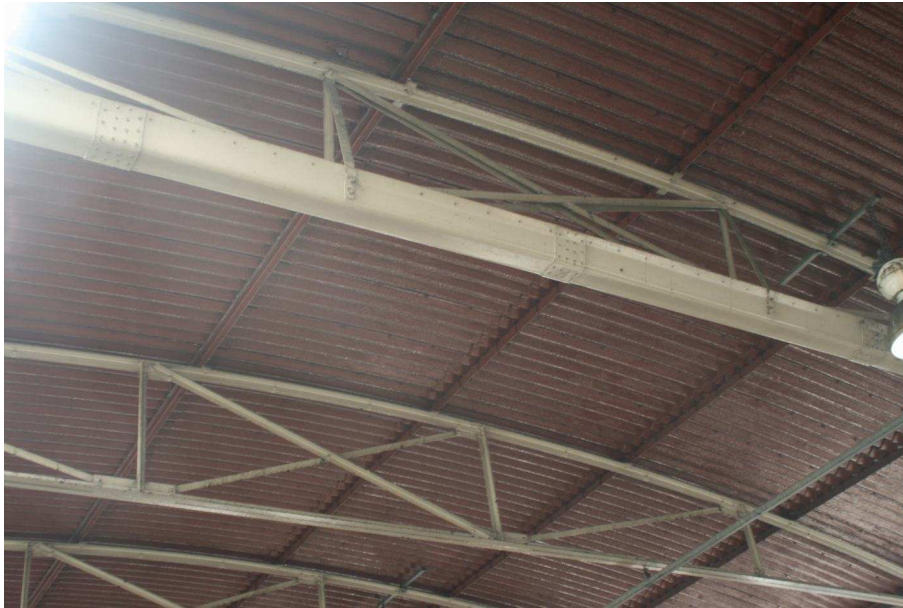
Detail of truss type 2 showing fewer plates and larger rivets in comparison to the type 1 trusses
